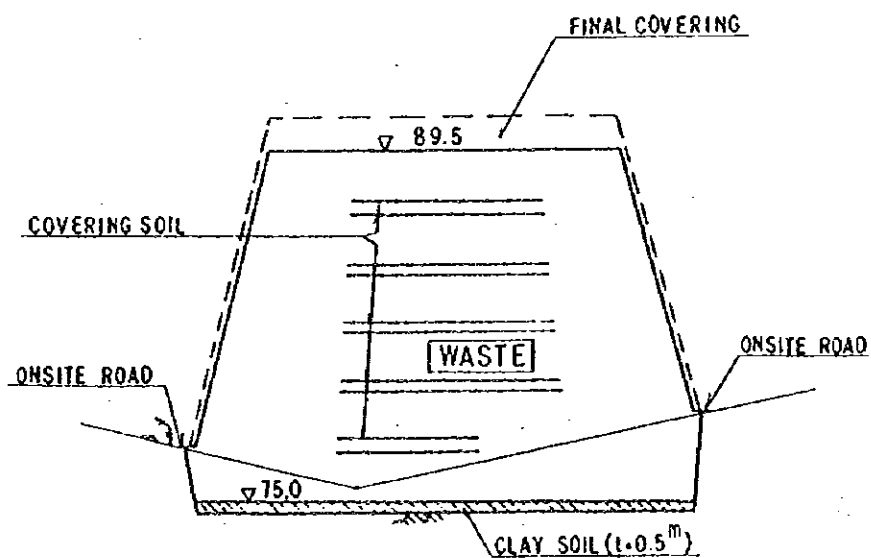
Facility Plan of Lahmidate Disposal Site (Zone I)
